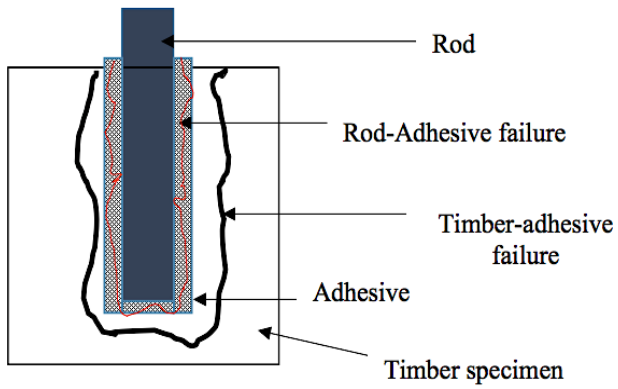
Specimens Failed in Timber-Adhesive and Rod-Adhesive.
